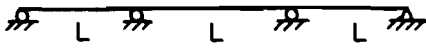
Typical interior girder idealization of a composite steel bridge.
